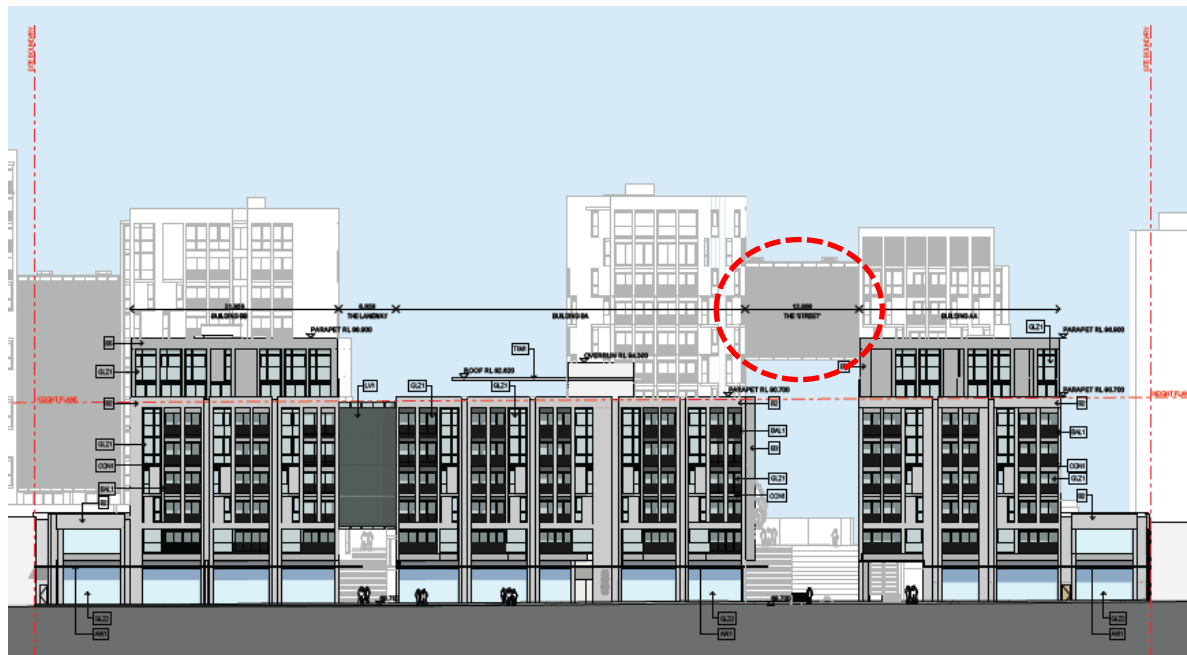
Rowe Street Elevation (Plan 1501, Revision 1)
